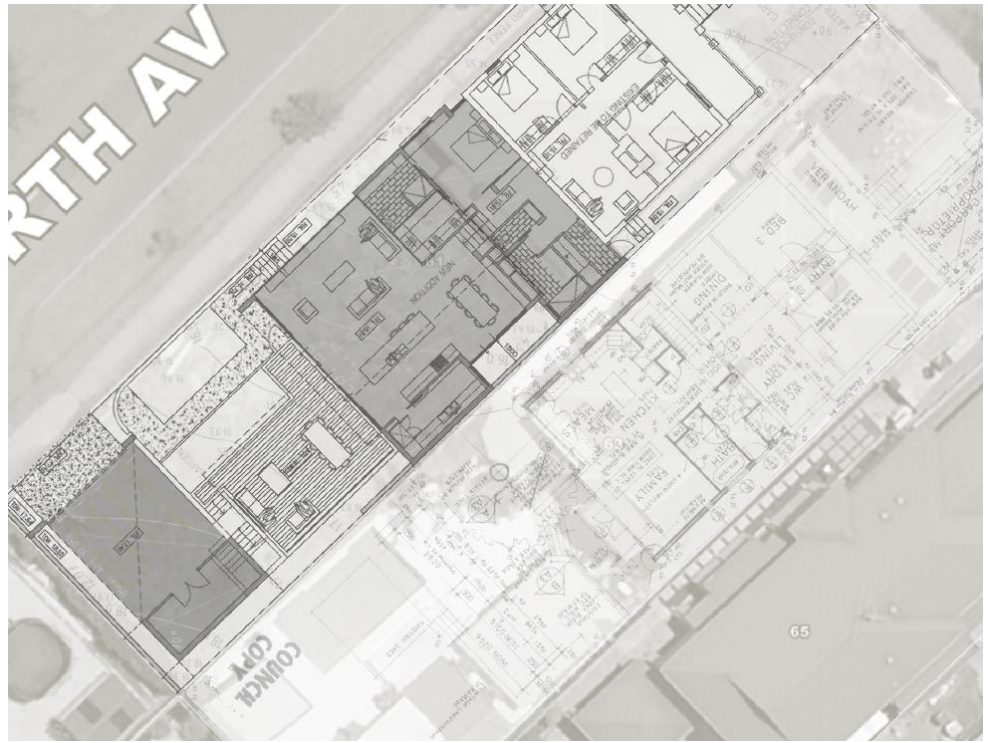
Overlay image of proposed floor plan at 61 Gwentyfred Road and existing ground floor plan at 63 Gwentyfred Road. Please note this overlay image is an approximation and should only be used for guidance purposes.
